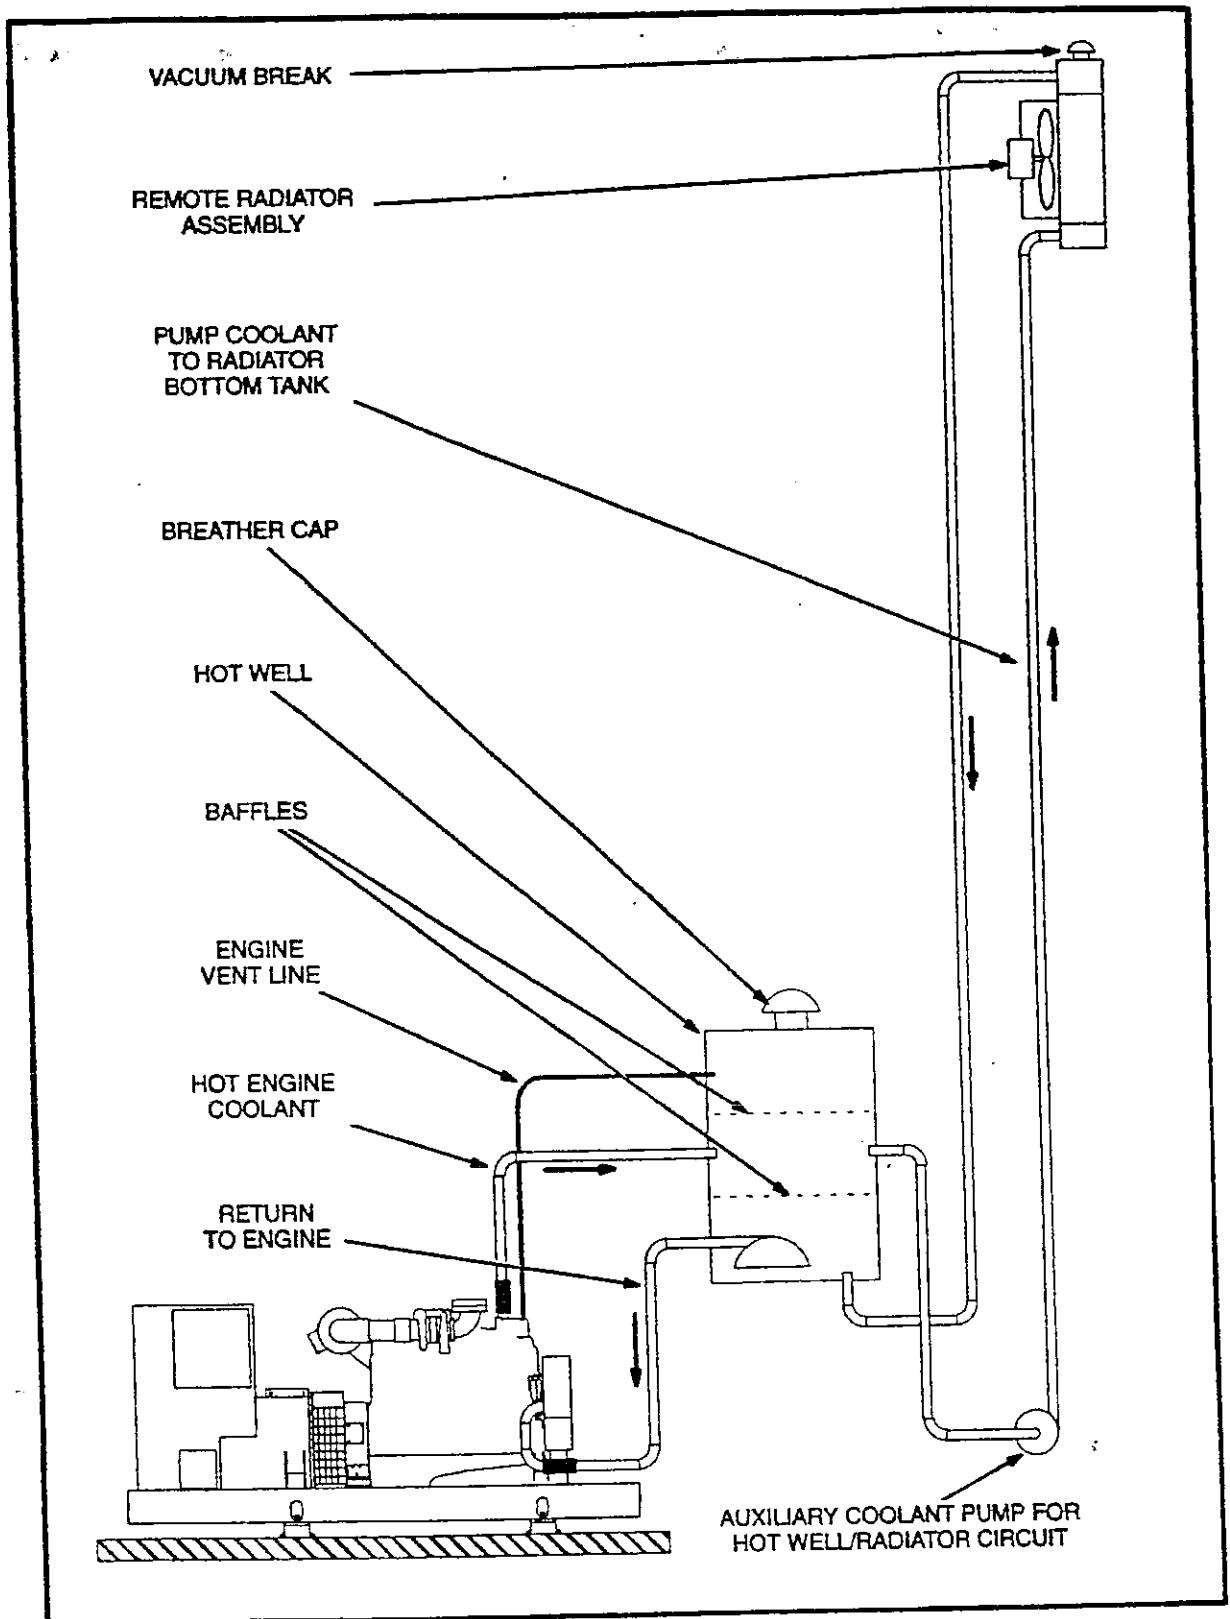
REMOTE RADIATOR WITH HOT WELL AND AUXILIARY COOLANT PUMP
